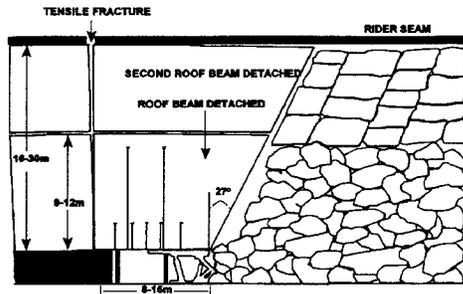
Conceptual model of a weighting type room failure, based on observations and measurements at the Queensland recovery room failure (after Klenowski et al., 1990).
